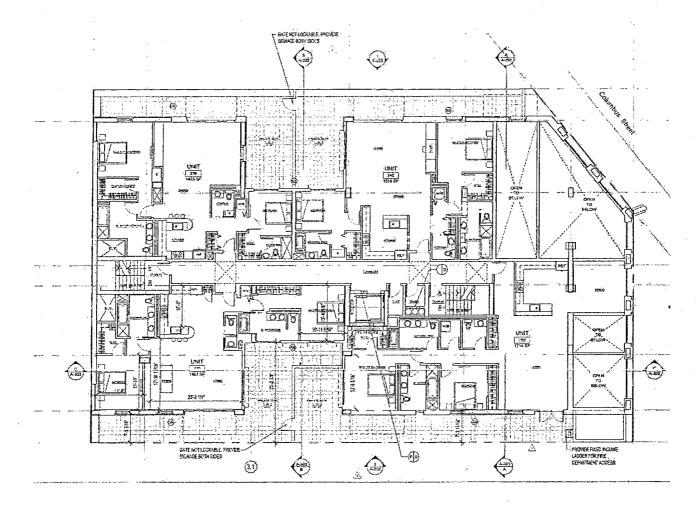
PROPOSED 1731 POWELL ST SECOND LEVEL PLAN Source: SWS 1/7/13
